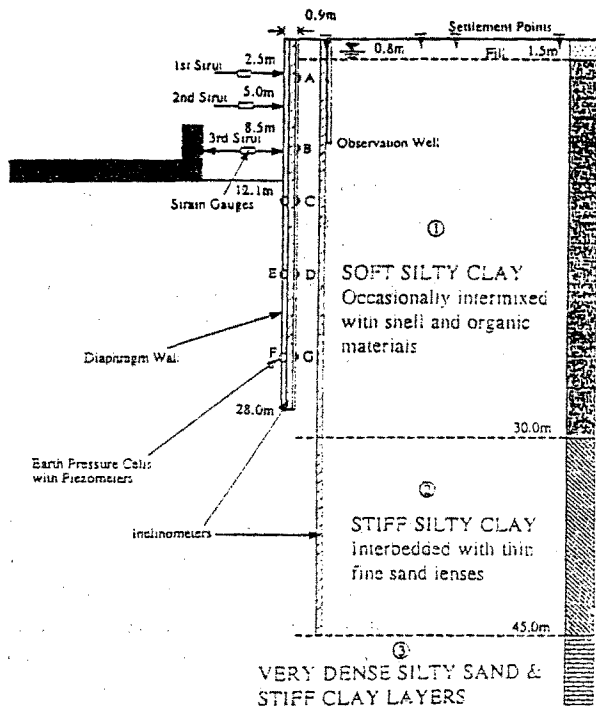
Composite Cross-Section of Field Instrumentation on West and South Walls of Convention Center
